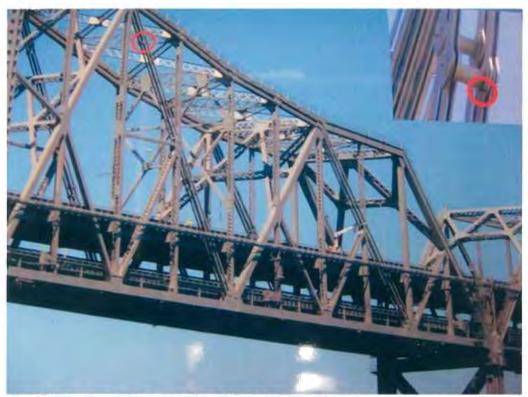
San Francisco-Oakland Bay Bridge East Span. Location of cracked eye bar.
